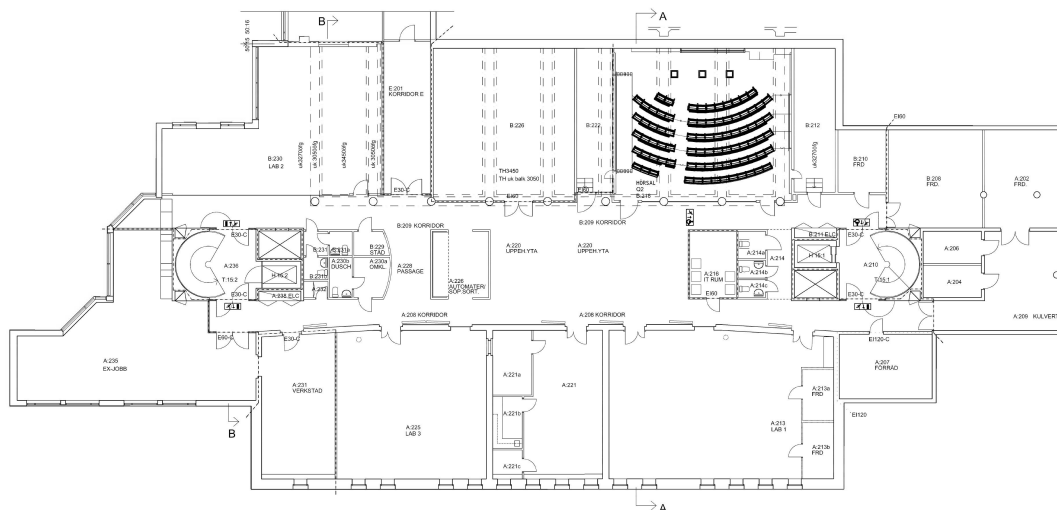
Map of the second floor of the *Q building*. The floor is underground.
